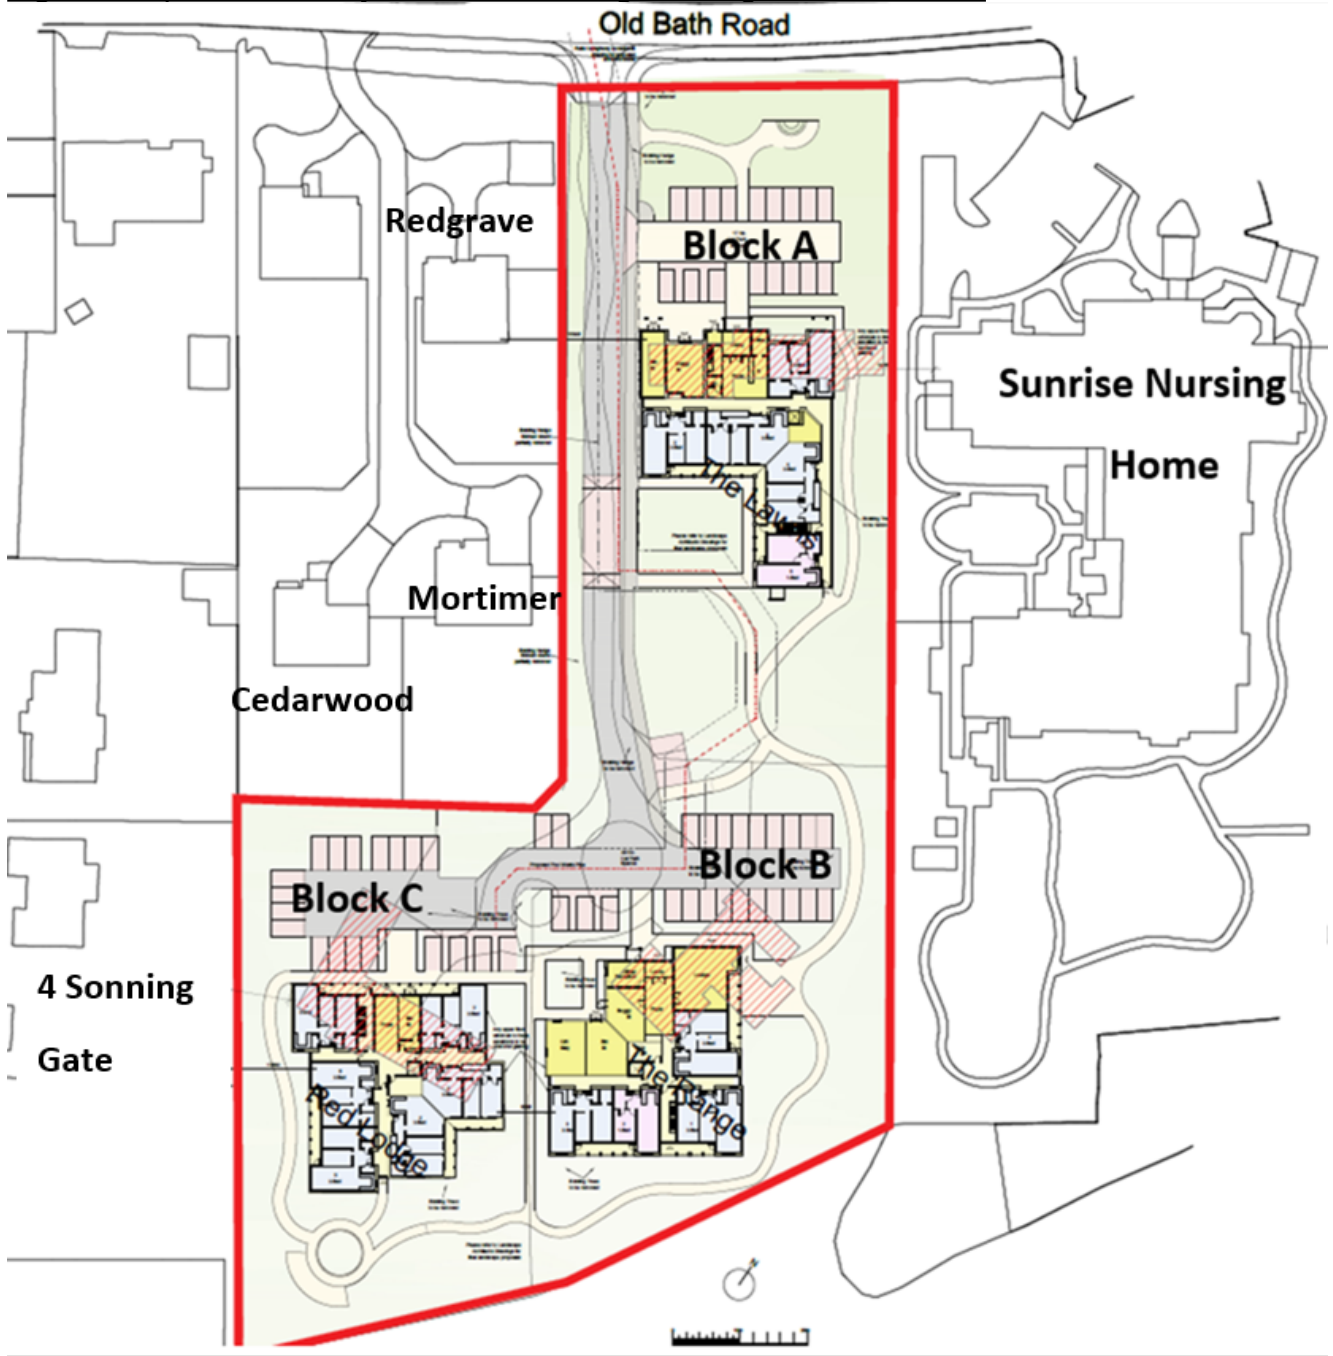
Proposed Site Layout Plan - Existing dwellings hatched in red
